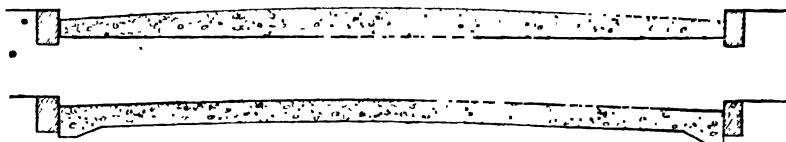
Sections of Unreinforced Slabs with Horizontal Base and with Cambered Base.
